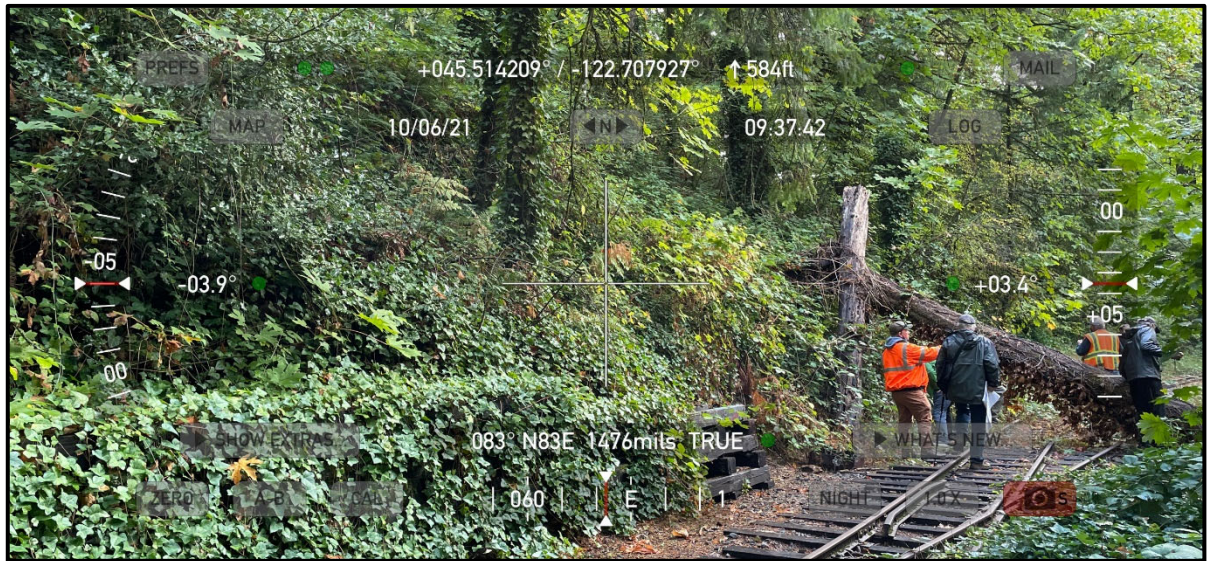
Area near 1980's landslide and Culvert 9 looking southeast
